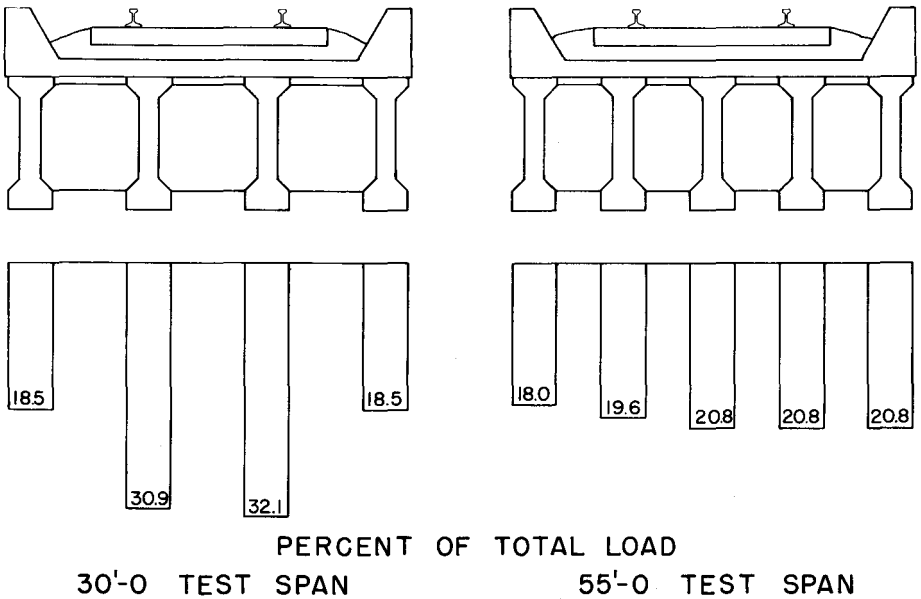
Transverse load distribution to prestressed concrete girders, Southern Pacific Co., Houston, Texas.
